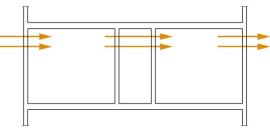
Ventilation through opposite facing walls (cross ventilation)
